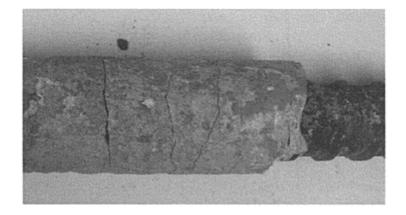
Cracking of a resin grout column exposing the black rebar.
